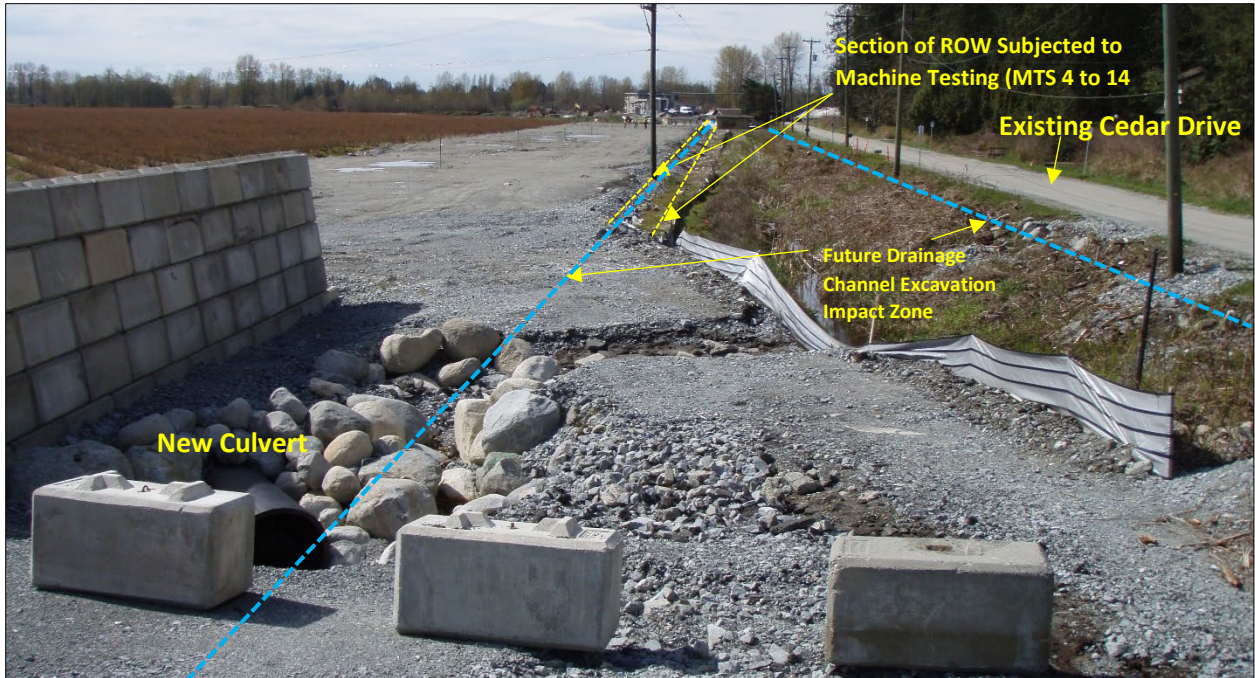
An April 19, 2022, view of the north-central section of Development Area 7 showing section along the west side of the new road ROW that was subjected to machine testing (MTs 4 to 14), looking southwest. The new road bed will be subjected to additional road-base pre-load capping in mid-2022. A new 10 m-wide drainage channel will be excavated between existing Cedar Drive (upper right), and the new ROW (upper left).
